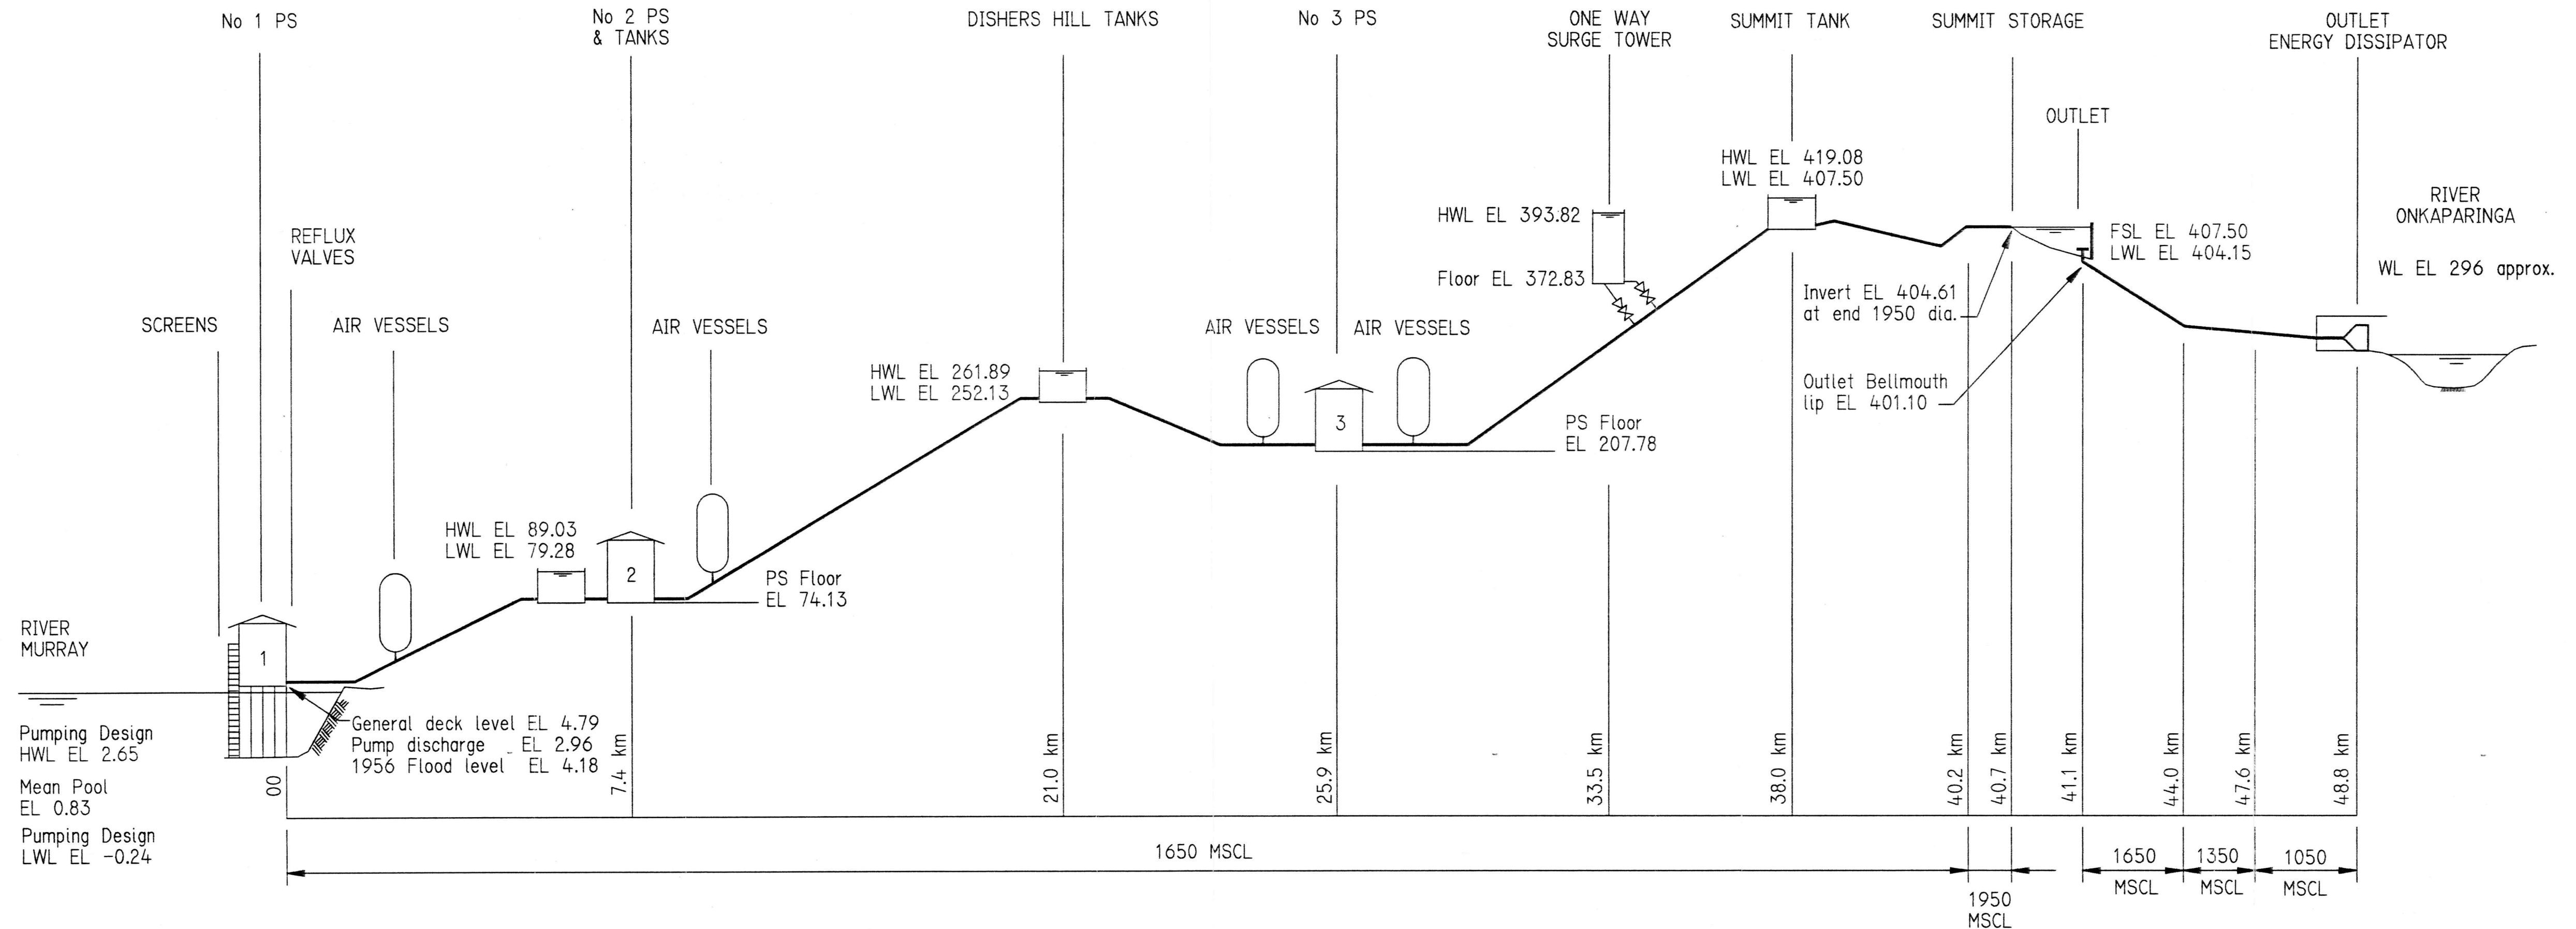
The Murray Bridge-Onkaparinga Pipeline Longitudinal Schematic Section
